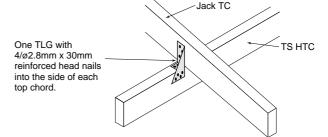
Jack Truss to Truncated Girder Truss cont.
